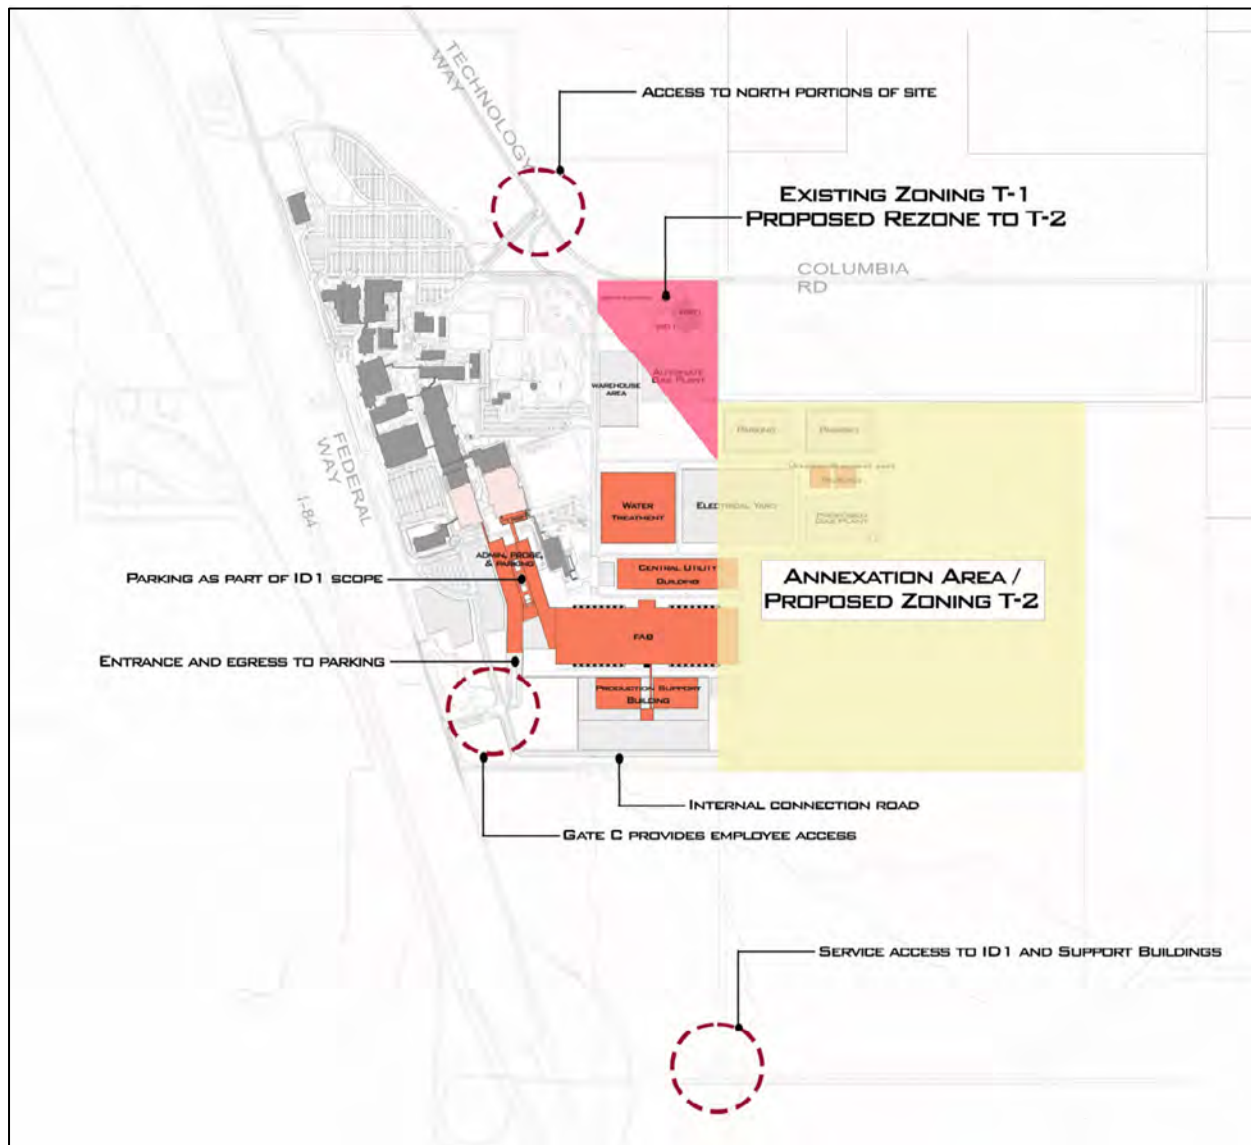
shows the general location of the Fab on Micron's campus. The site plan is shown in Figure 2.
